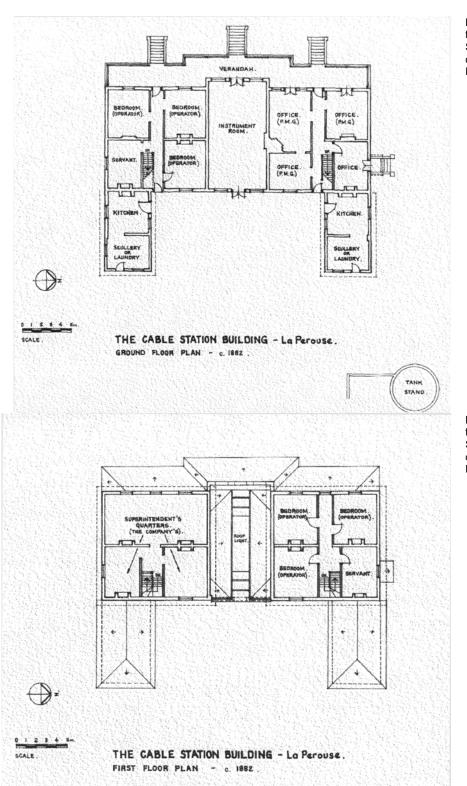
Ground floor plan of Cable Station building as constructed (from Danis et al.: 162).
